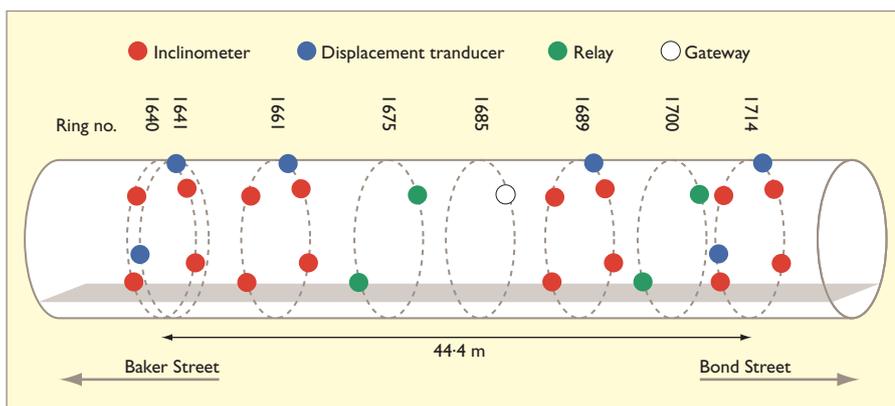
The London Underground wireless sensor network was arranged over five separate tunnel rings – relay nodes are used to transmit data to the gateway
